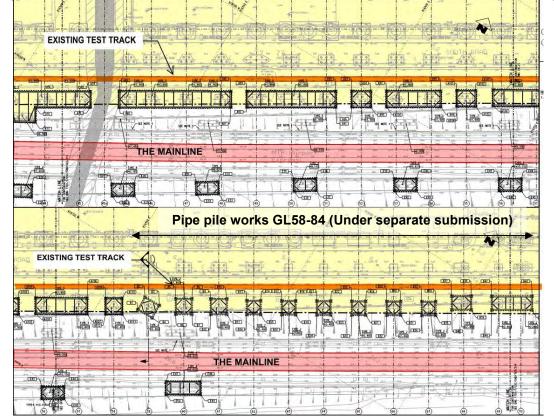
Sheet Pile Layout Plan – G.L. 44-57/P-Q (Top) and G.L. 56-70/P-Q (Bottom)
